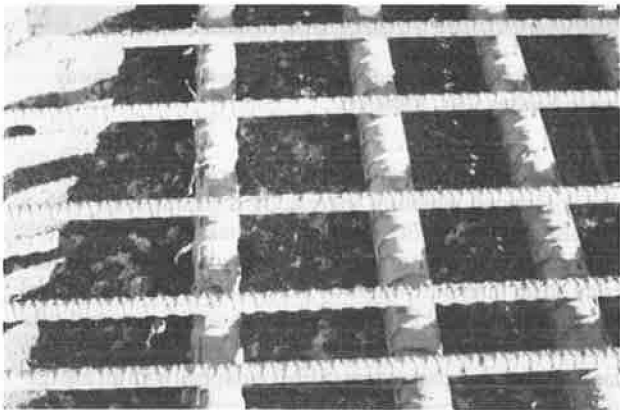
Condition of reinforcing steel on bridge shown in Figure 11.
